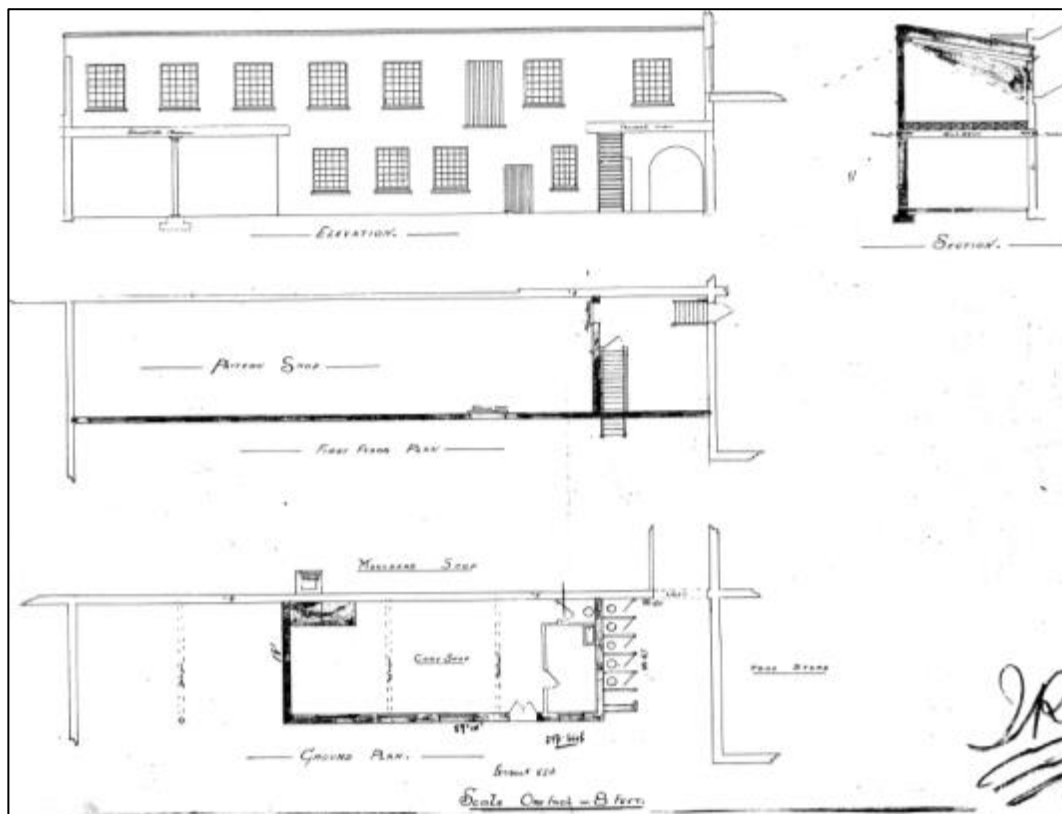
1903 plans of the pattern shop and core shop in Section 58 (DCC Archives).
